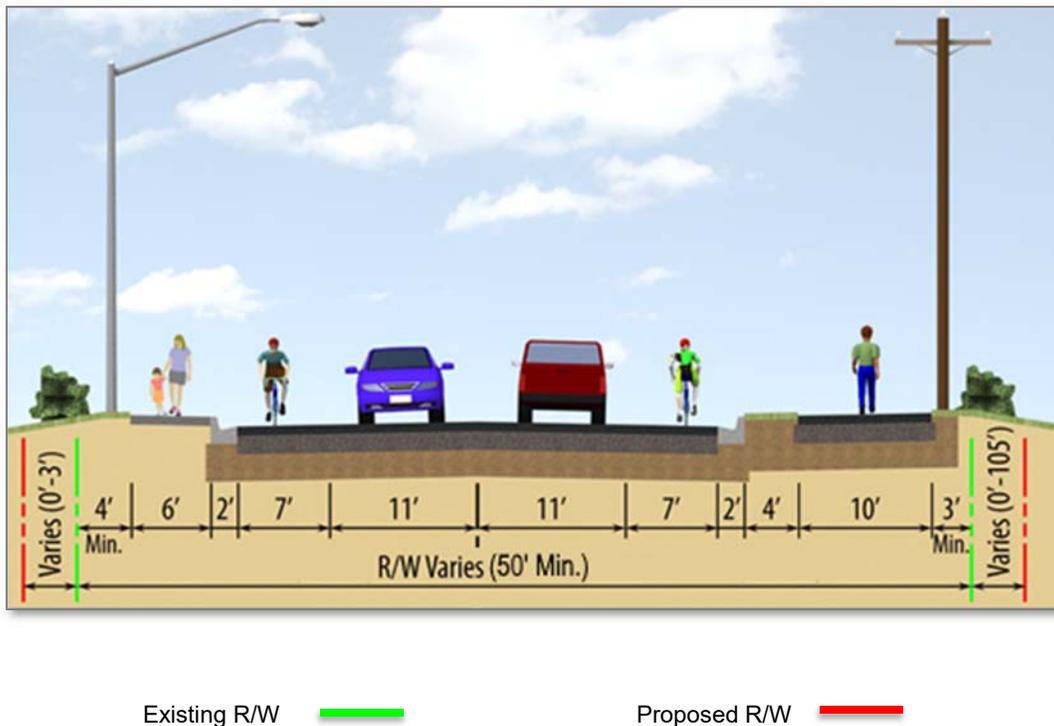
BUILD ALTERNATIVE 3 - ROADWAY TYPICAL SECTION
